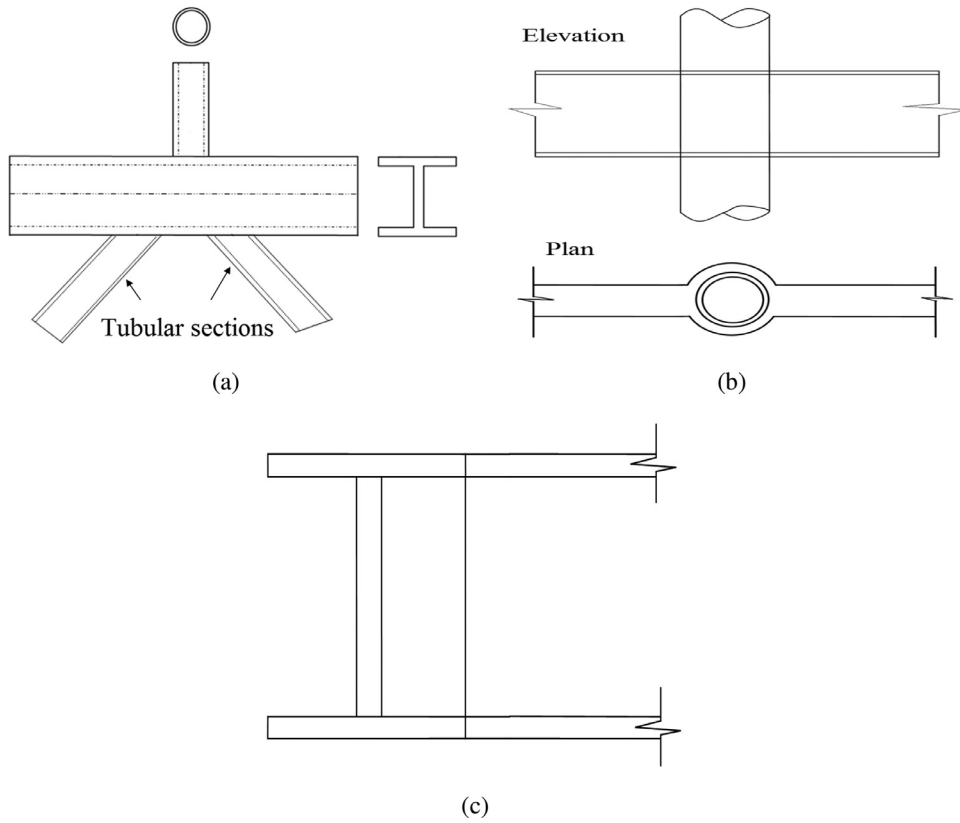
Non-tubular joints: (a) Tubular to a girder (I-section) connection, (b) Unstiffened I-section to CHS connection, and (c) Girder flange to girder flange connection.
